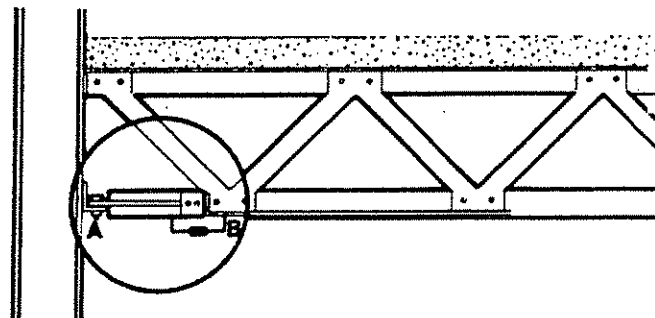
VE-dampers used in World Trade Center Towers [3M, 1995].
